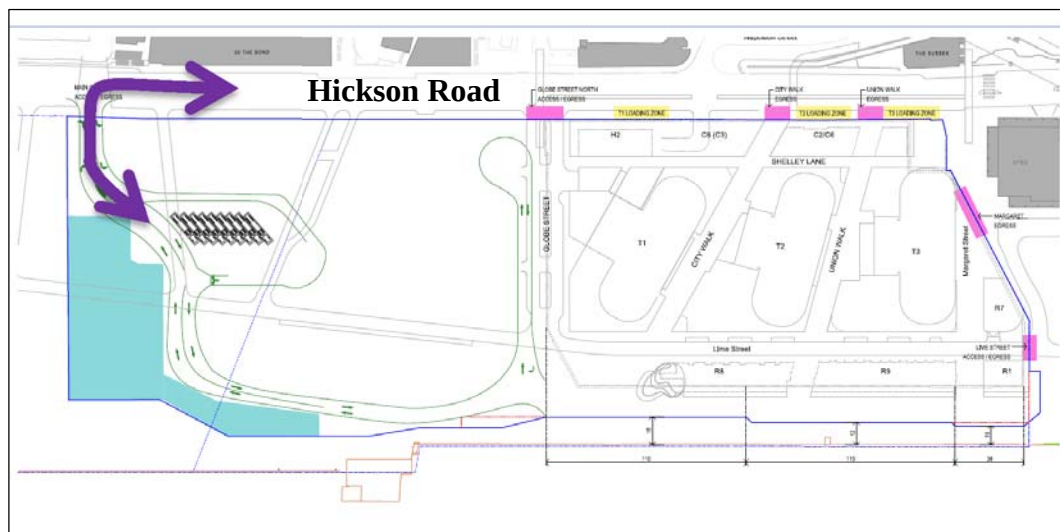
Proposed Construction Site Entry and Exit (indicative only)
